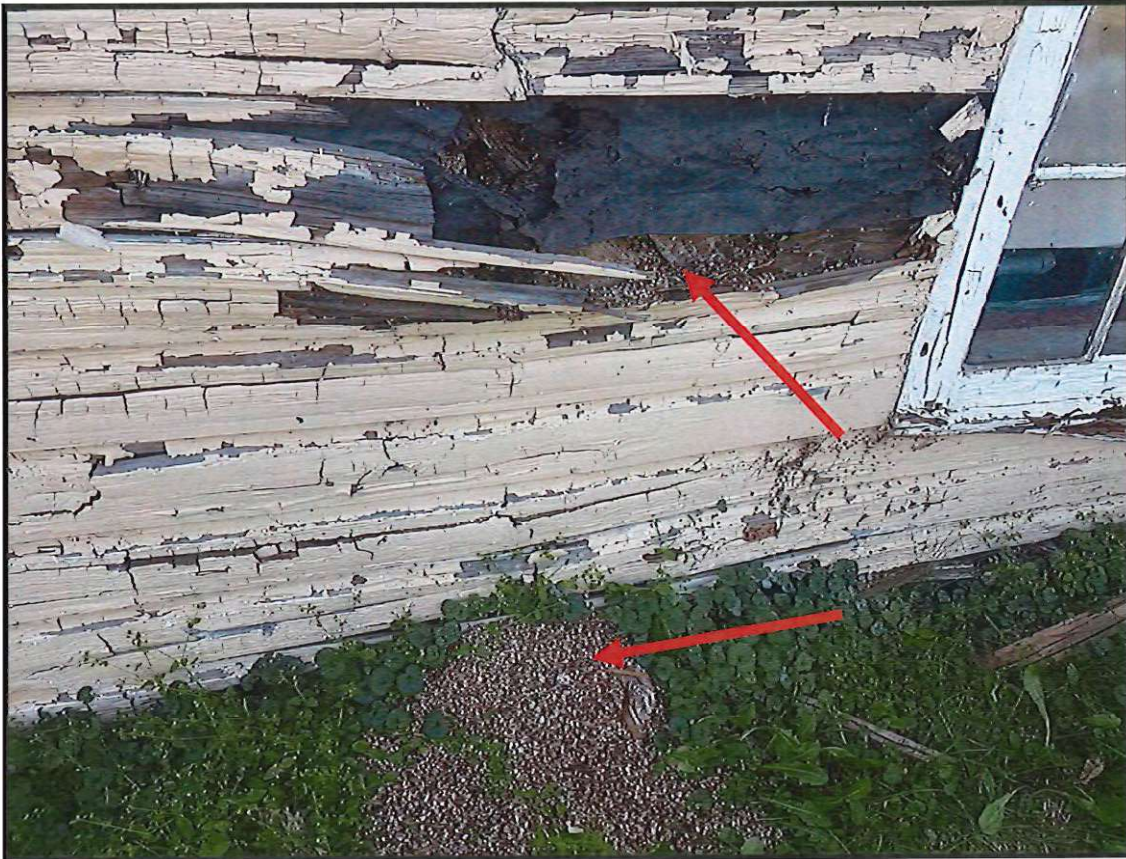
ASBESTOS CONTAMINATED VERMICULITE INSIDE WALL CAVITY (NORTH SIDE OF BUILDING)
